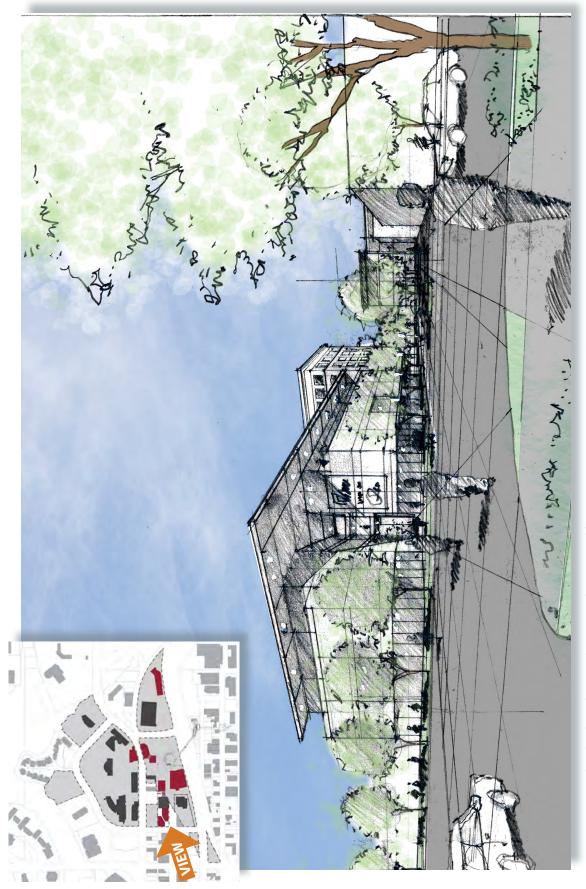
Master Plan Sketch, Looking Northeast toward Jensen-Byrd from Main Street/Pine Street Intersection
